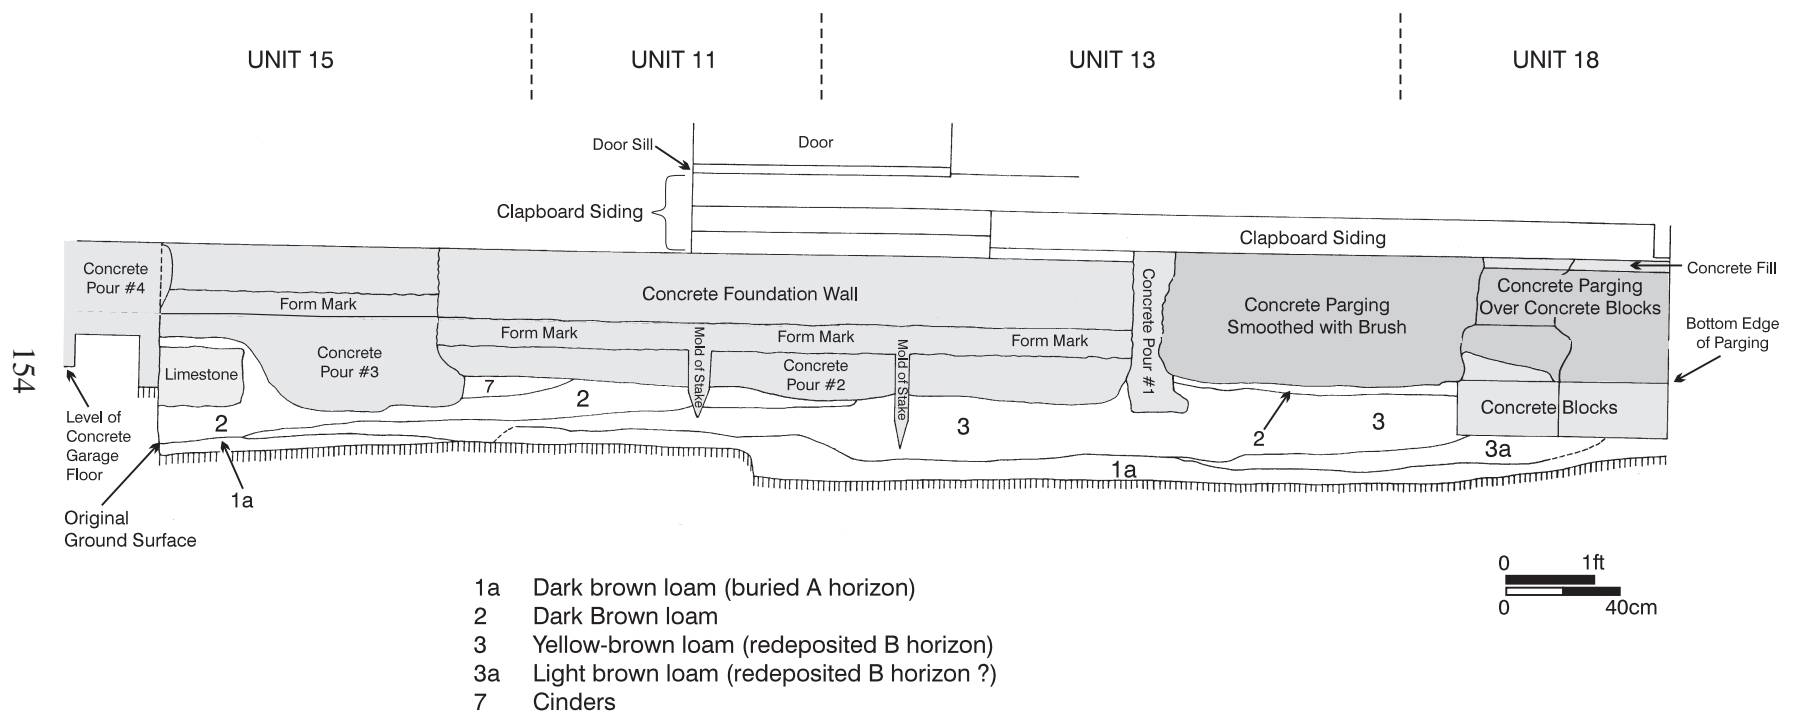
Profile, south wall of west wing, HS 10 (north wall of Units 15, 11, 13, and 18).
